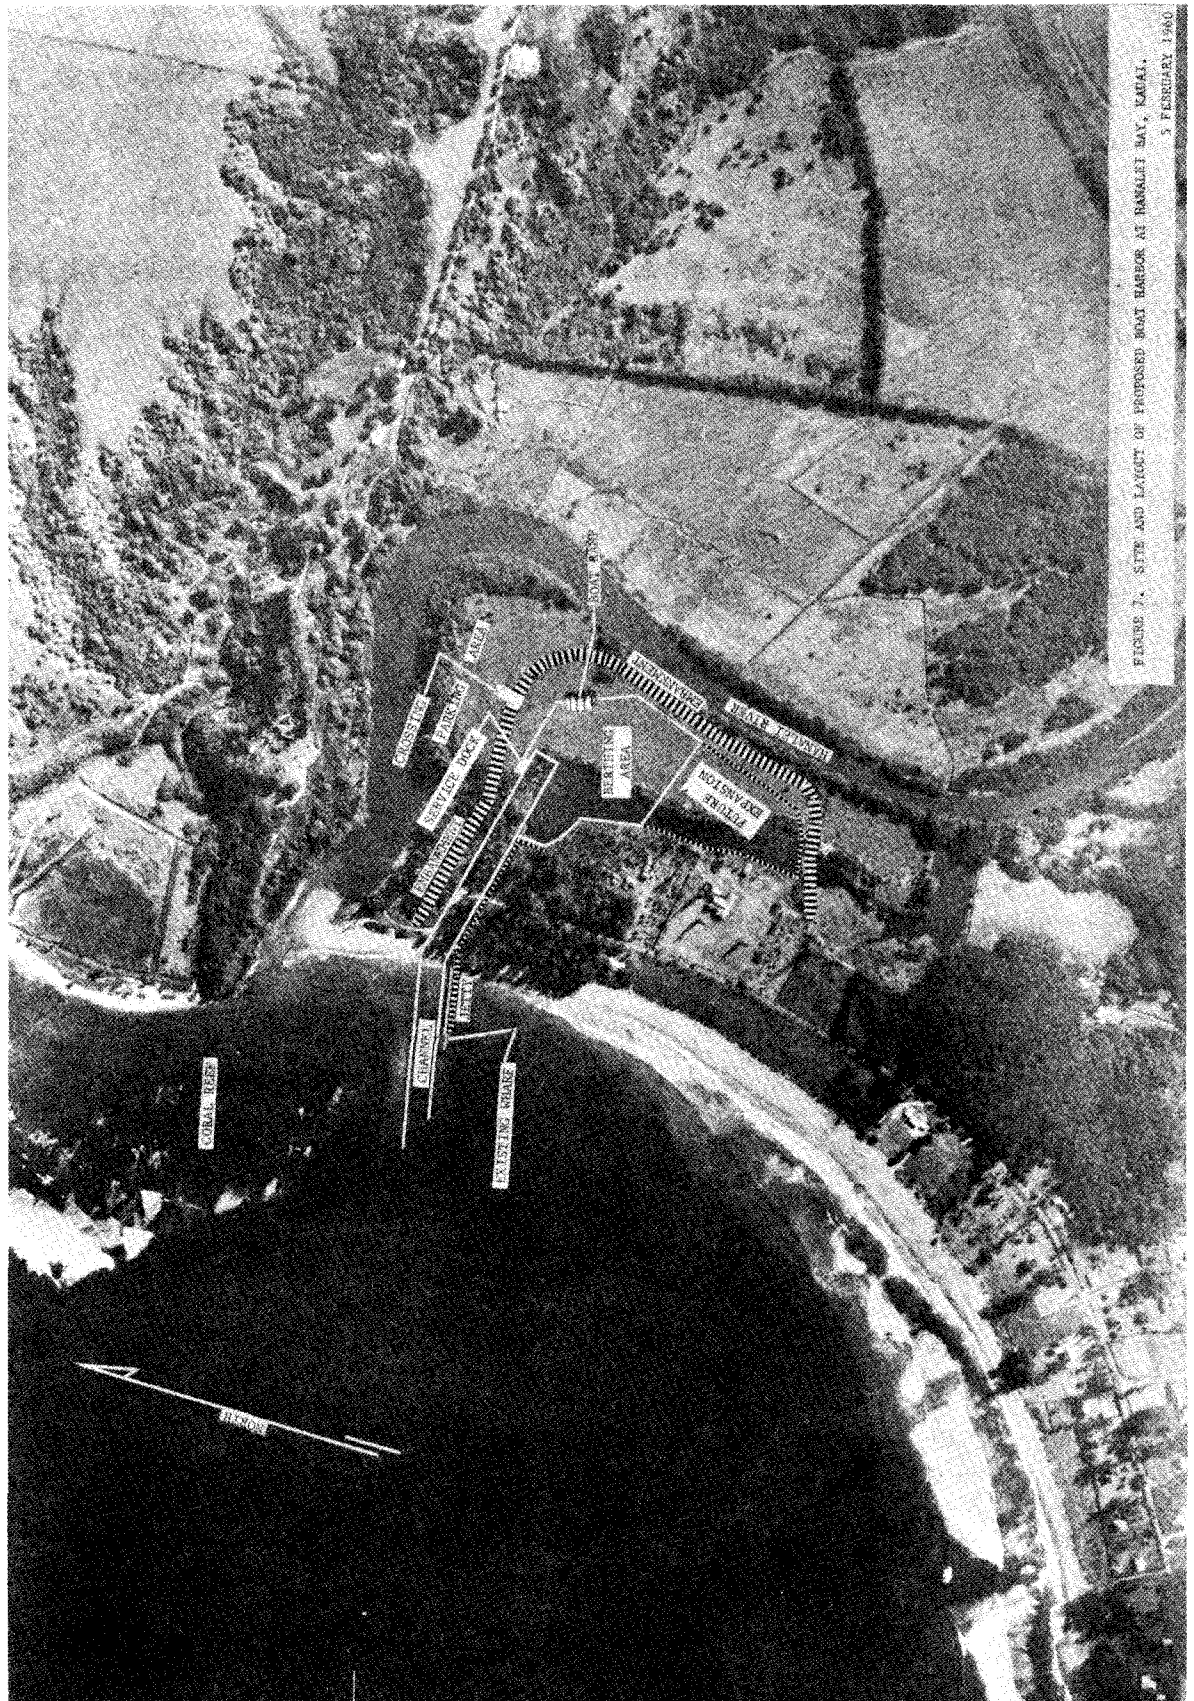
SITE AND LAYOUT OF PROPOSED BOAT HARBOR AT HANALEI BAY, KAUAI.
